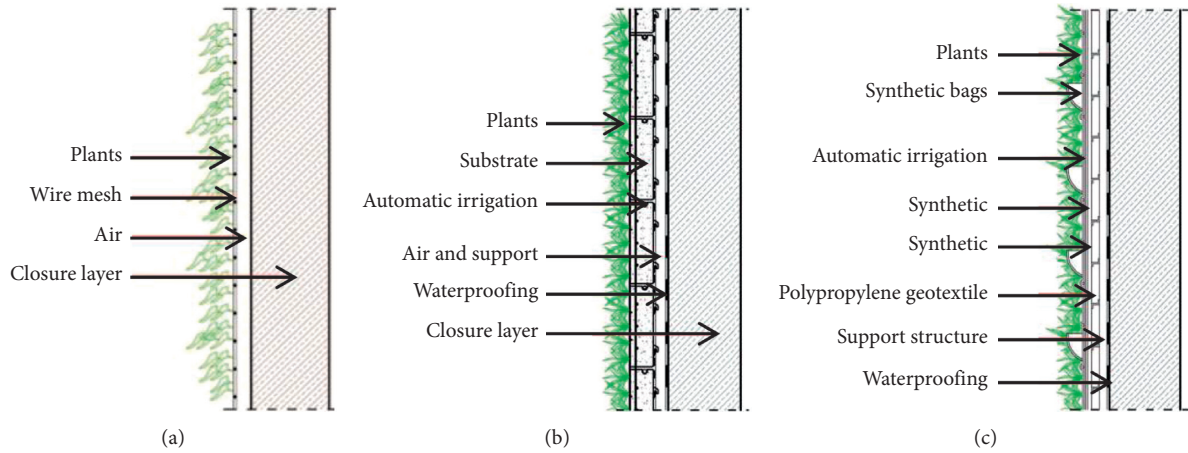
(a) Example scheme of the “green façade.” (b) Example scheme of the “living wall.” (c) Example scheme of the “garden wall.”
